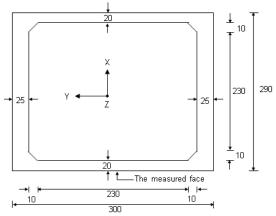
Plan view of the mold for the box element (h = 97 cm)
